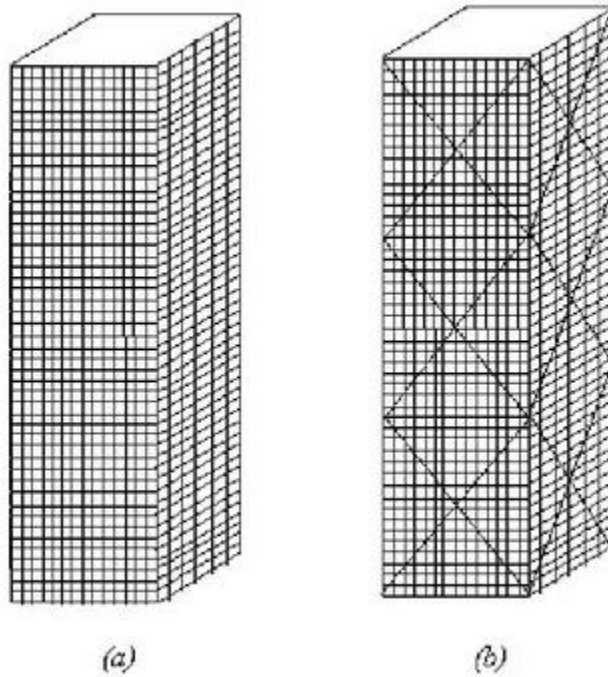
(a) Framed tube (b) Braced tube (Source: <http://www.yousaytoo.com>)
